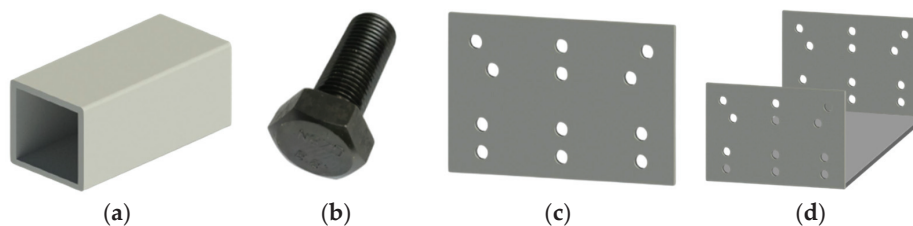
Materials used in tests of this study: (a) pultruded GFRP profiles, (b) steel bolt, (c) gusset plate, and (d) proposed integrated gusset plate.
